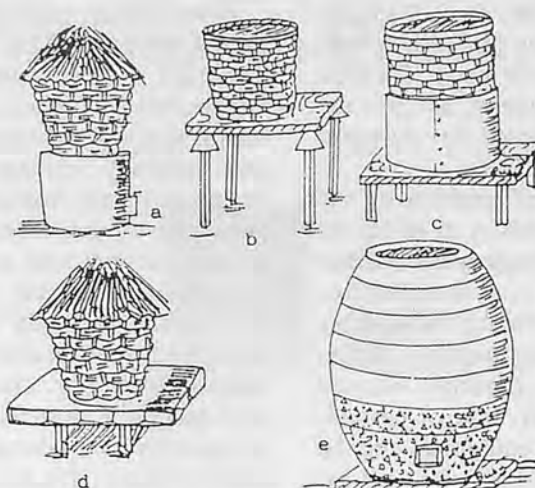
Improvements in traditional storage structures. (a) Straw storage structure on rec rings and provided with an outlet, (b) Providing a platform on a metallic inverted cones stand, (c) metallic sheet nailed to bamboo structure, (d) Providing a stone/masonry platform, (e) Skirting of earthen structures by baby chips up to 300 mm height.
